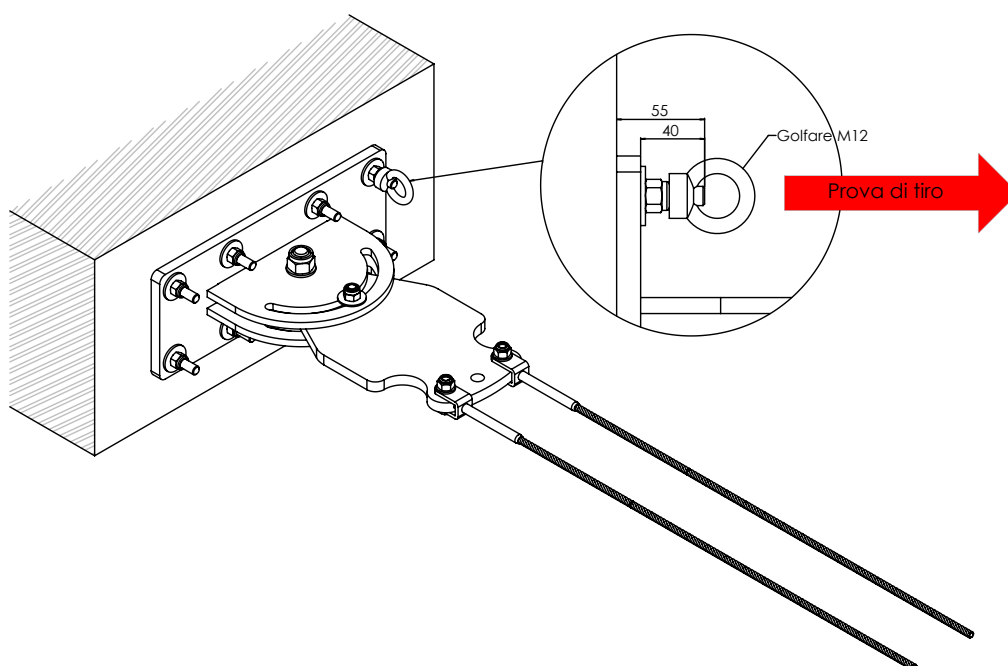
Detail of inspection at assembly plate Sicurair, with exposed bars for 20 cm and eyebolt for the test shot.
